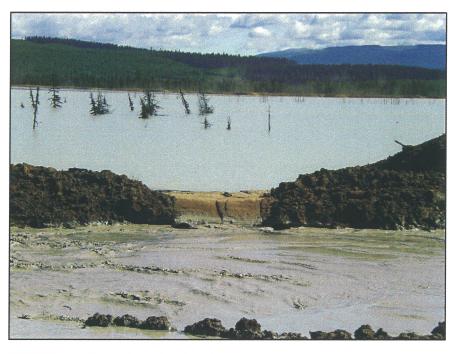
Typical sand cell drains, which are raised as the sand elevation rises.
